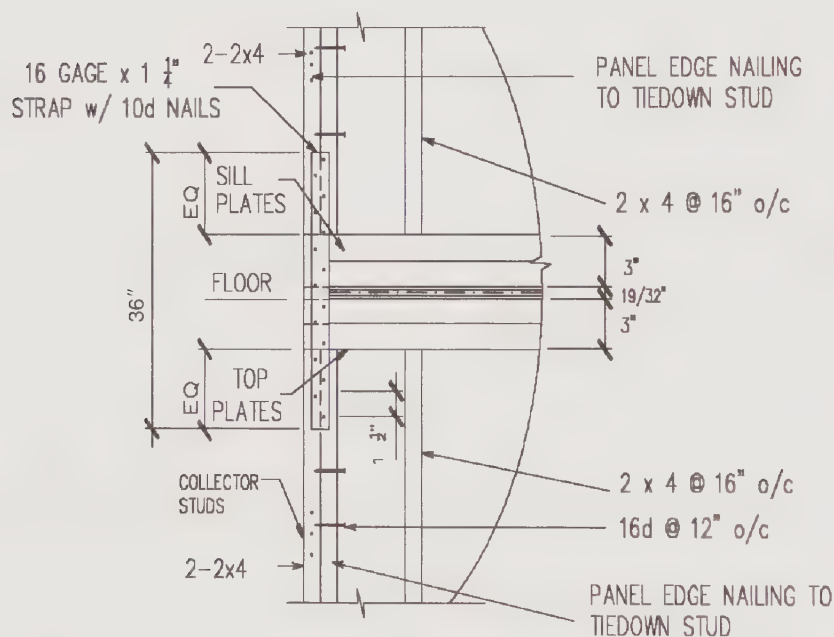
Tiedown connection at the third floor for shear wall C.
